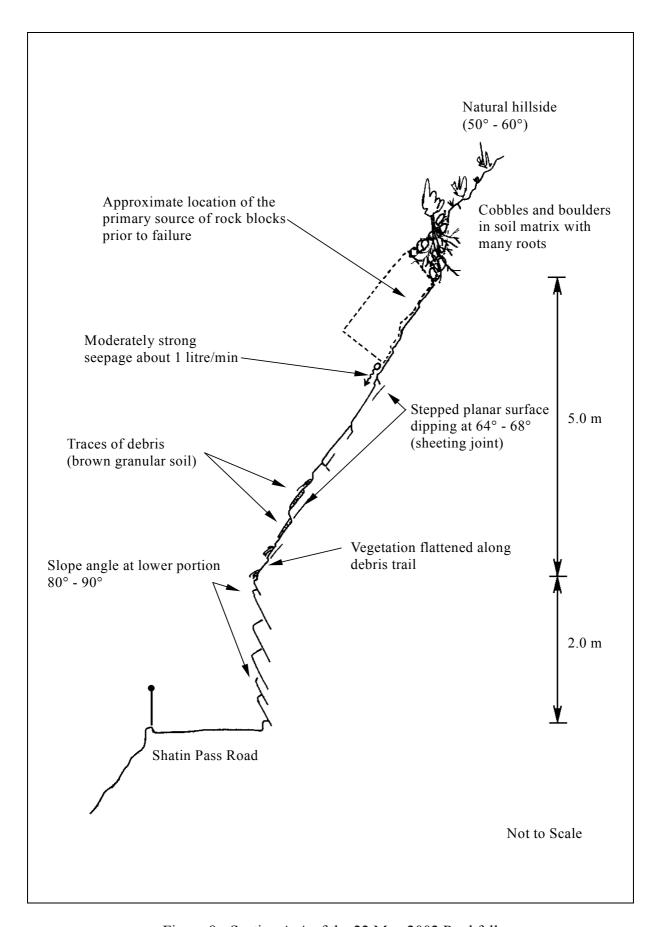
Section A-A of the 22 May 2002 Rockfall
